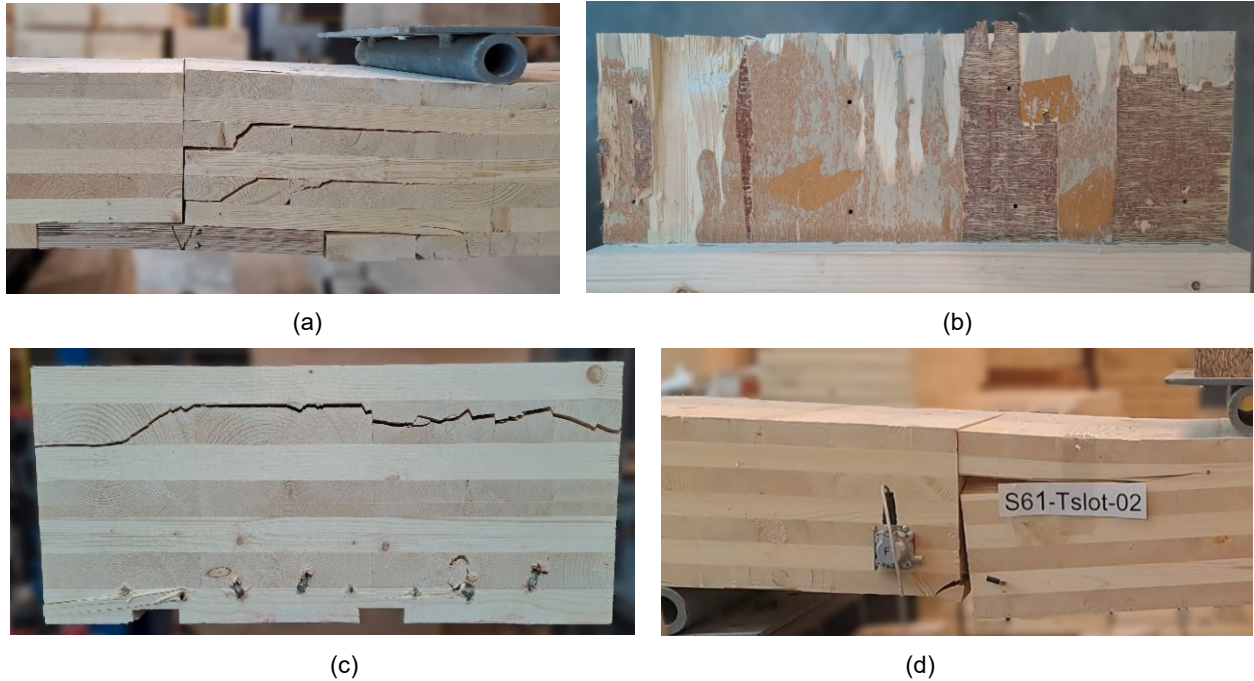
Failure modes in 3-point tests: a) S1, b) S2 plywood surface c) S3 cross section at connecting line, d) S3 side view
